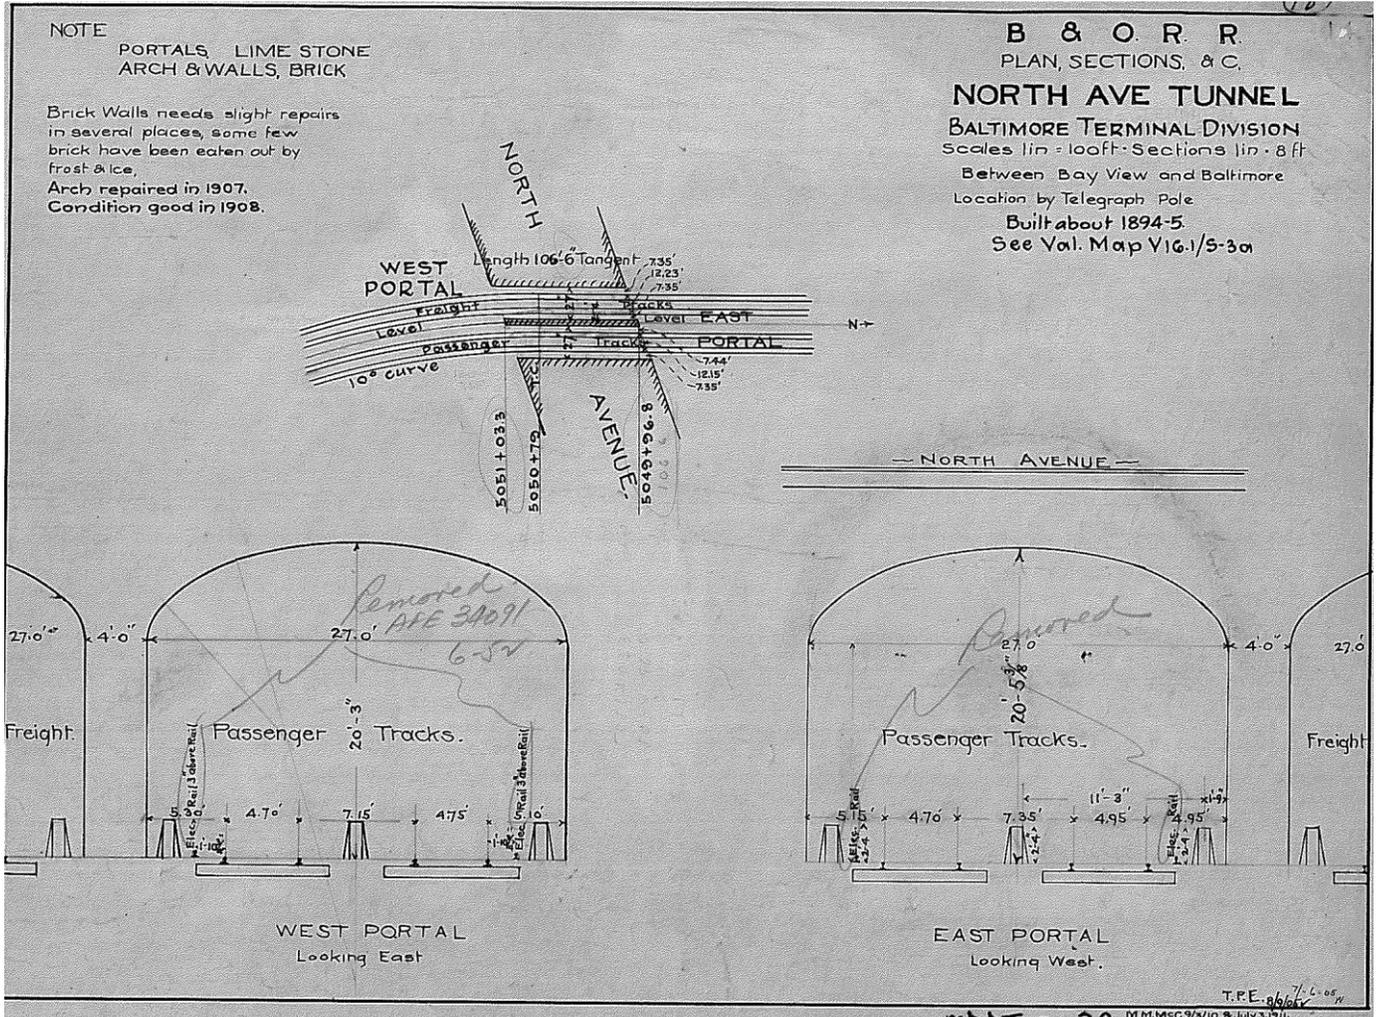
Plan sheet showing the B&O Railroad south and north portal sections, indicated in the image as the “west” and “east” portals, from “B&O RR Plan, Sections, &c. North Ave. Tunnel,” 1905 (annotated in 1905, 1910, 1911, and 1952 [assumed]).
